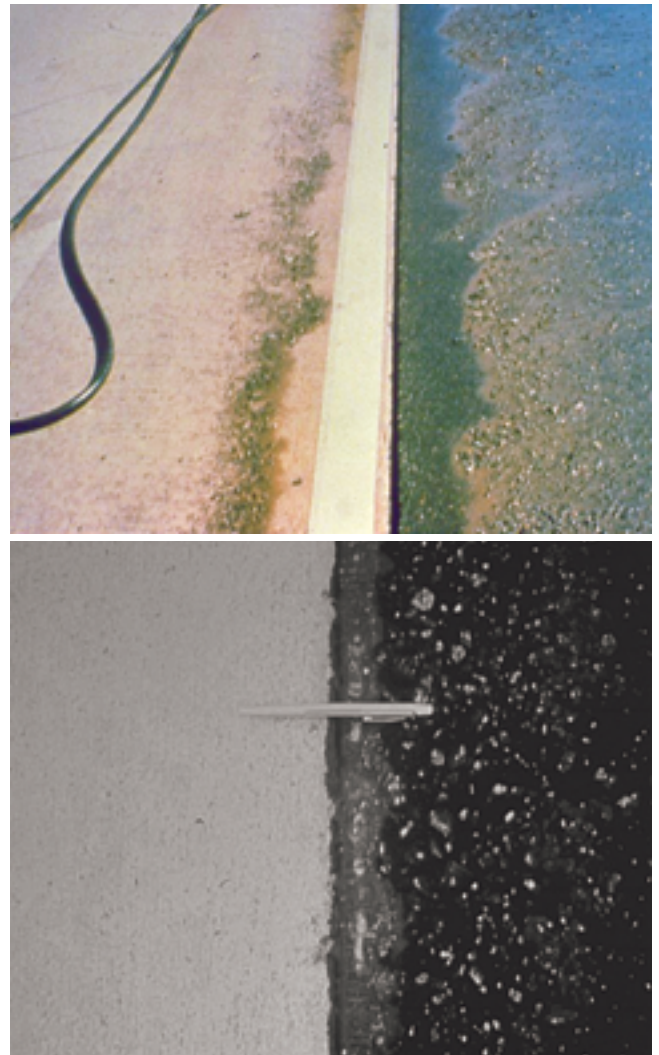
Prepared (top) and sealed (bottom) joint between concrete mainline and asphalt shoulder
